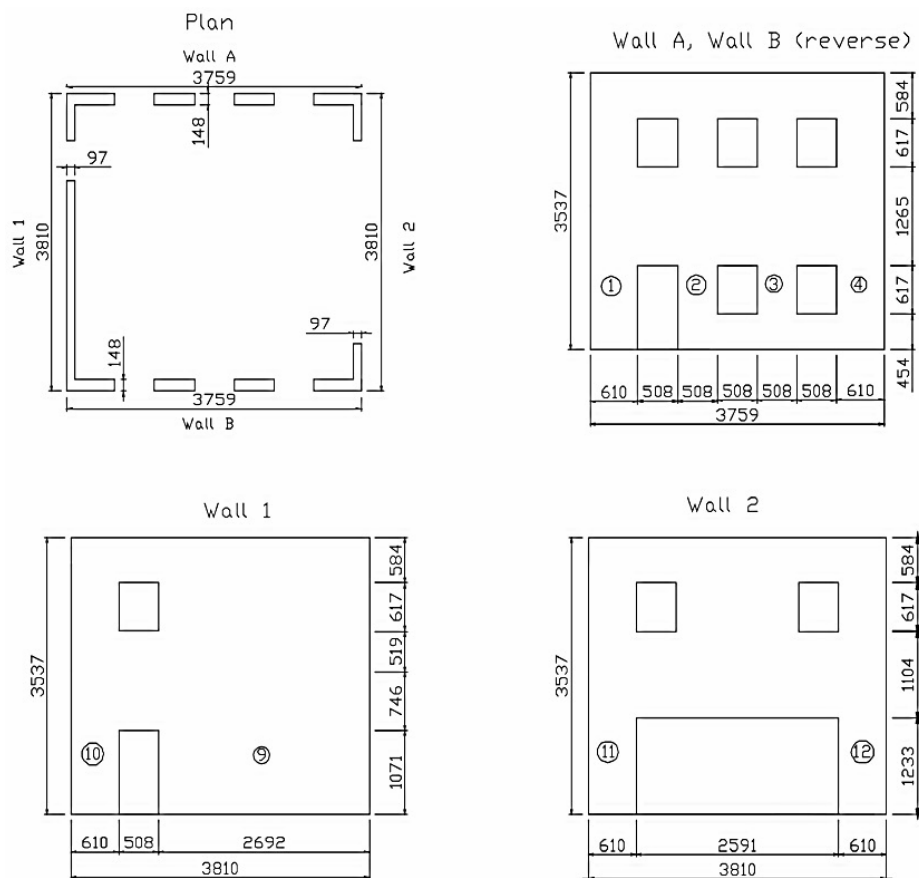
Elevation and plan layouts of the building (dimensions are in millimeters)
